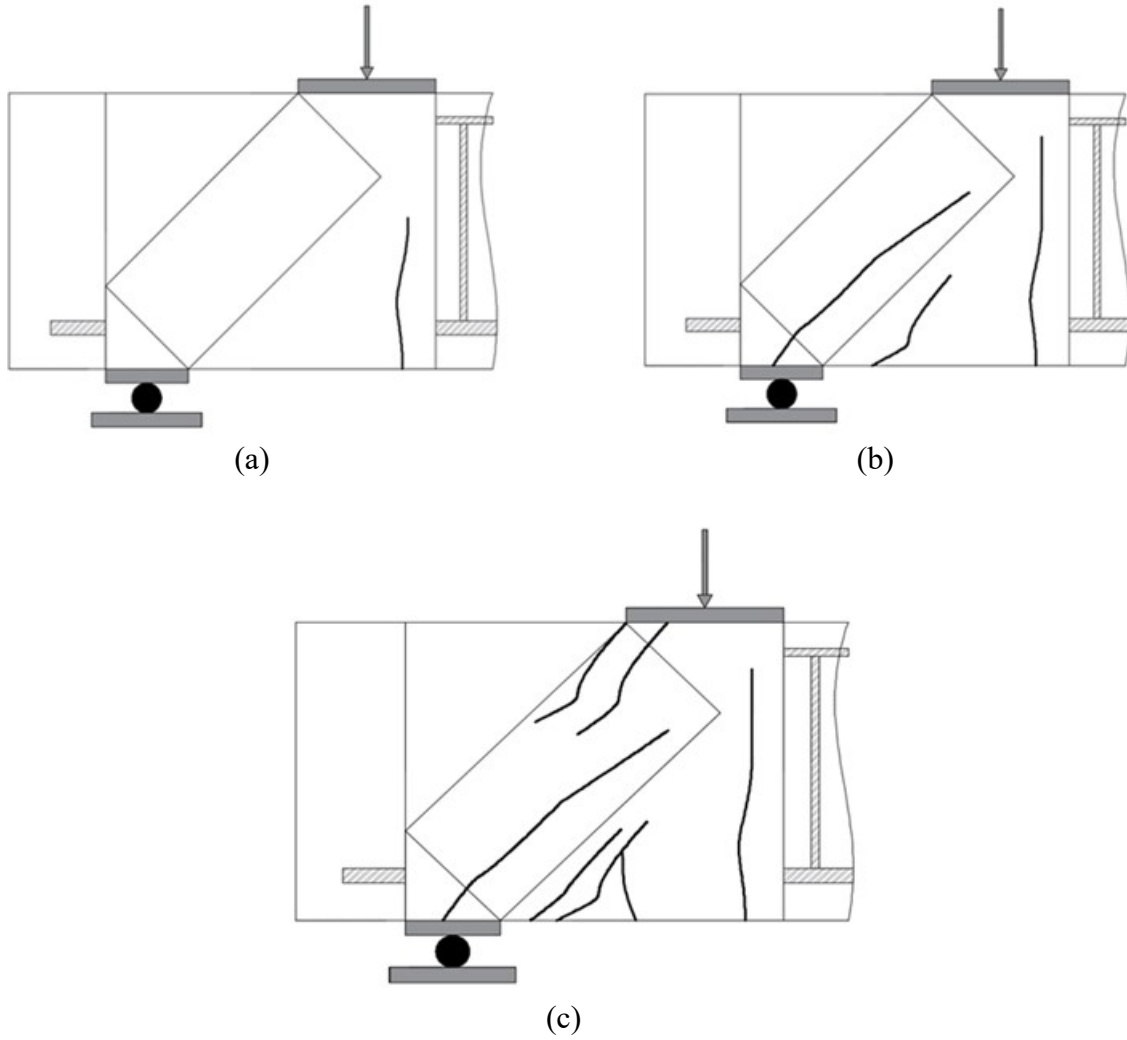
Observed crack growth in specimen with longitudinal bar anchored with straight reinforcement. Specimen NH-3-8-5-13-F4.1-2
